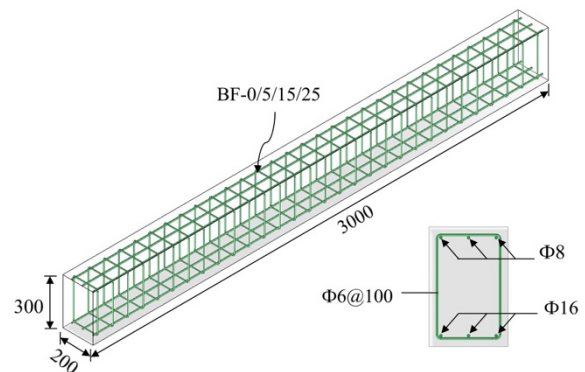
Detailed dimensions and reinforcement arrangement of the test beams (units: mm)
